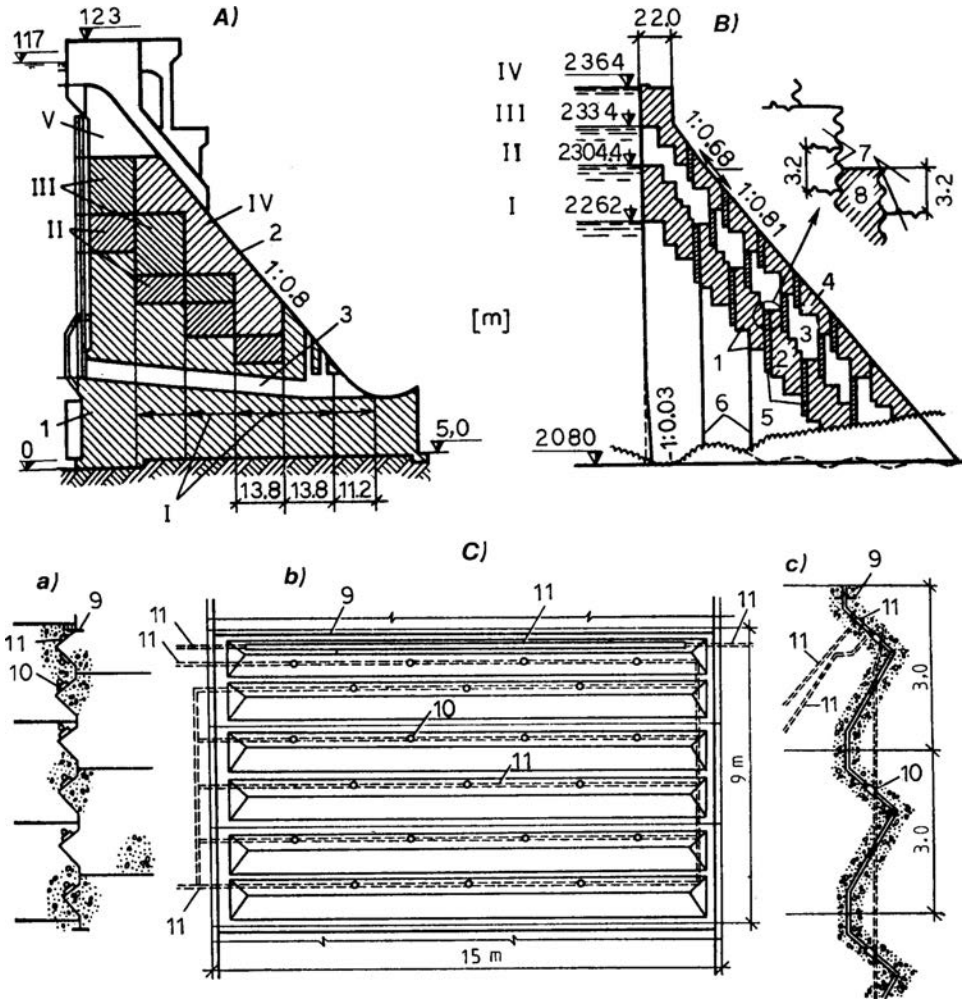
Concreting of blocks forming columns in the Bratskaya (A), and Grande Dixens dams (B), as well as structure of a temporary joint for the Bratskaya dam (C). (a) Vertical section along staggered joint; (b) view of the joint; (c) detail (I–V) stages of construction; (1–4) Profiles of the dam during certain construction stages; (5) vertical joints between blocks; (6) joints in the first construction stage; (7) block of concreting; (8) filling with concrete; (9) external closing of the joint; (10) outlets for cement solution; (11) supply and off-take pipes for cement solution, or air.
